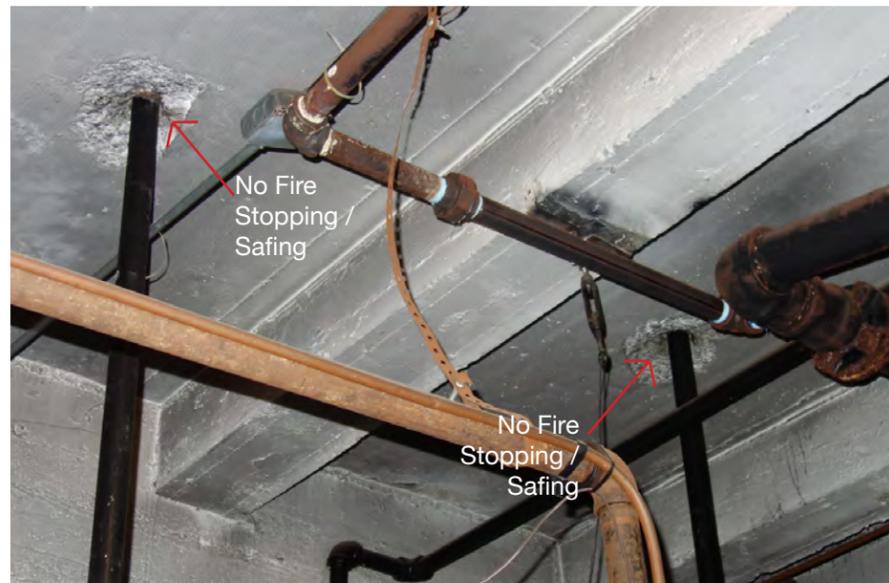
2 Basement - Pipe Penetrations Code Violation
